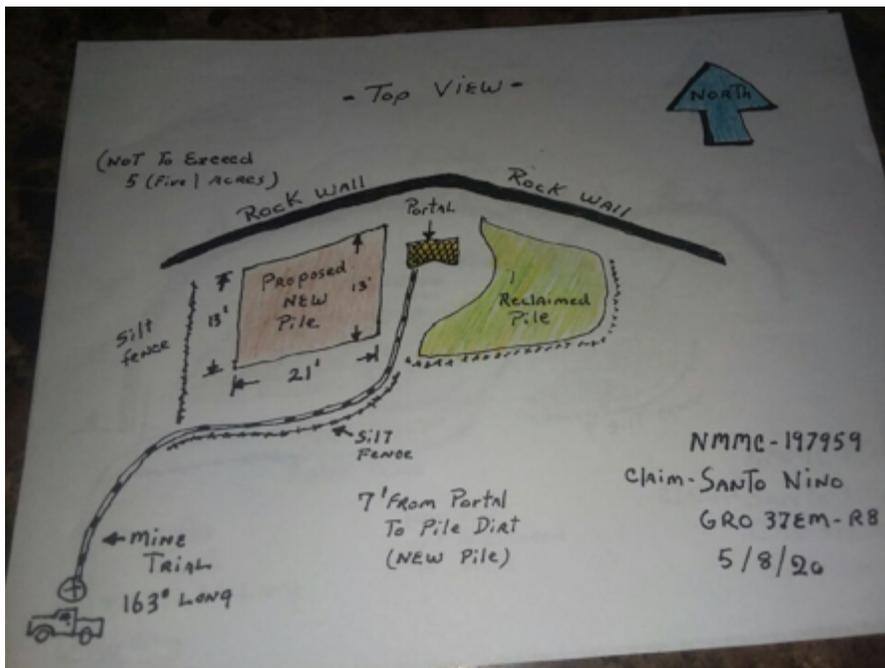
Exhibit B. Drawing Dimensions of New Pile, Reclaimed Pile, Mine Trail, Portal and Rock Wall
